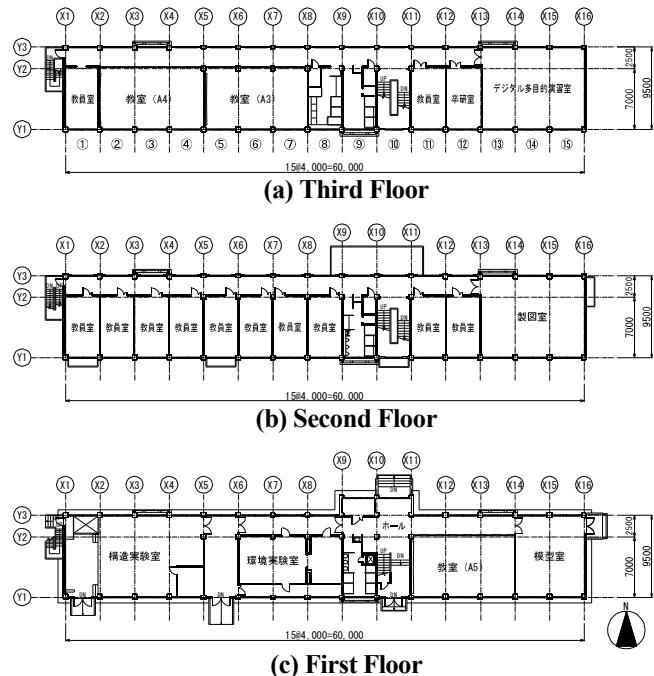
Floor Plans of the Building for the Faculty of Architecture and Structural Engineering
